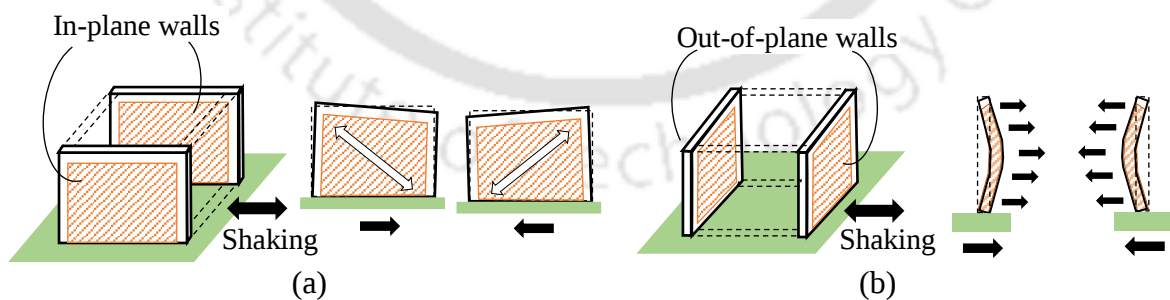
Depiction of CM walls subjected to: (a) in-plane, and (b) out-of-plane loading.
